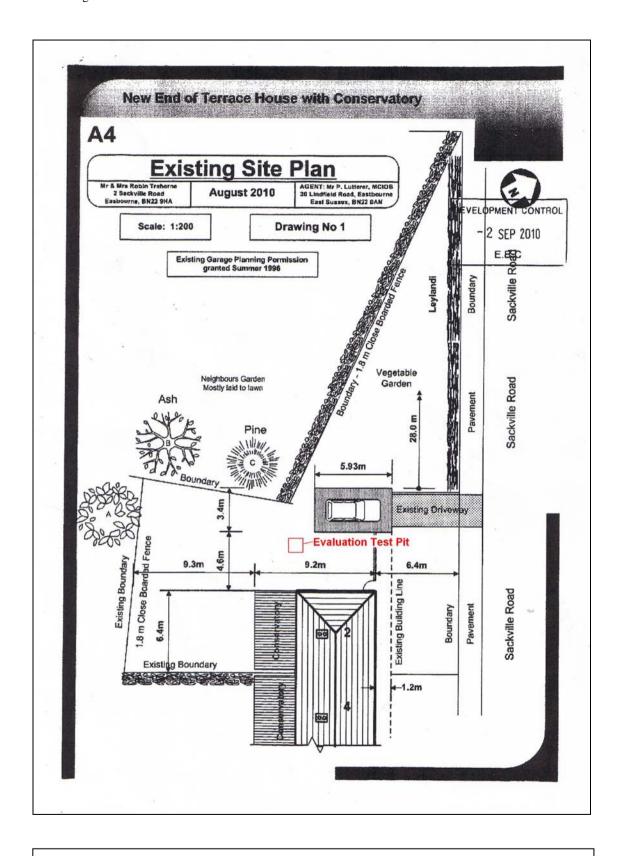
2 Sackville Road, Eastbourne: Test Pit Location Plan
